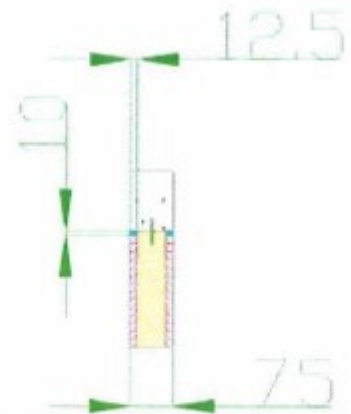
wall gypsum to stone thickness ≥ 100 mm
